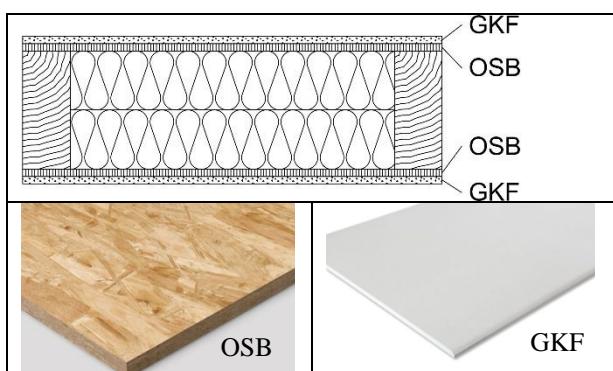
Basic construction of the timber stud wall with OSB and GKF planking.
